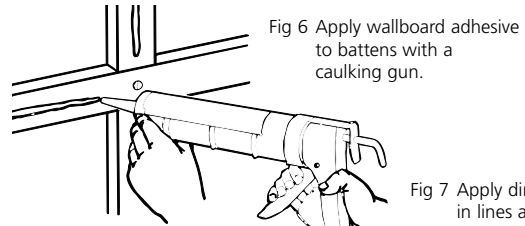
Apply wallboard adhesive to battens with a caulking gun.
